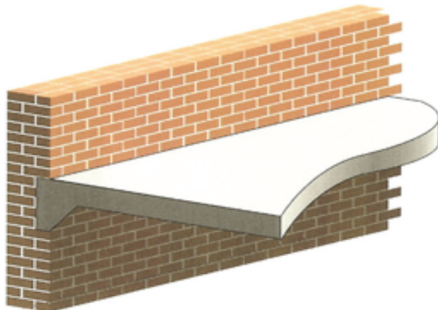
Schematic of ensuring the rigidity of horizontal structural planes such as floors and roof structures
